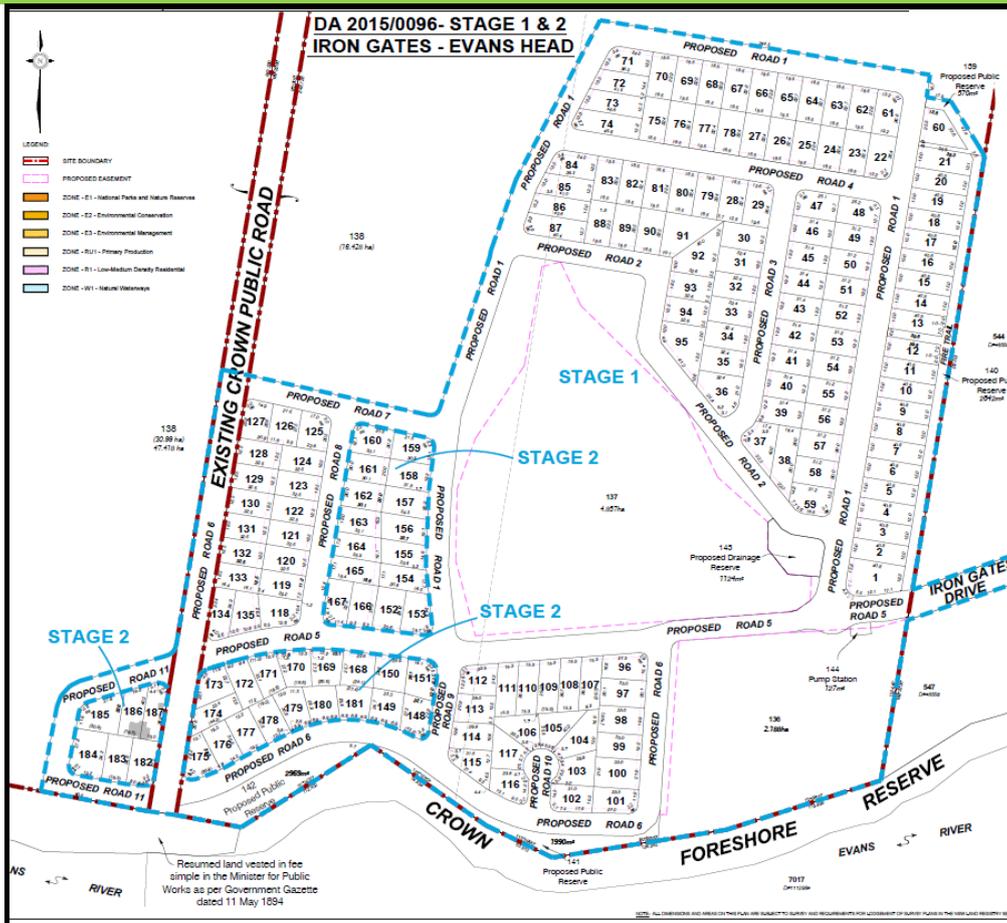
Proposed Development (Source: Concept Plan July 2021)
